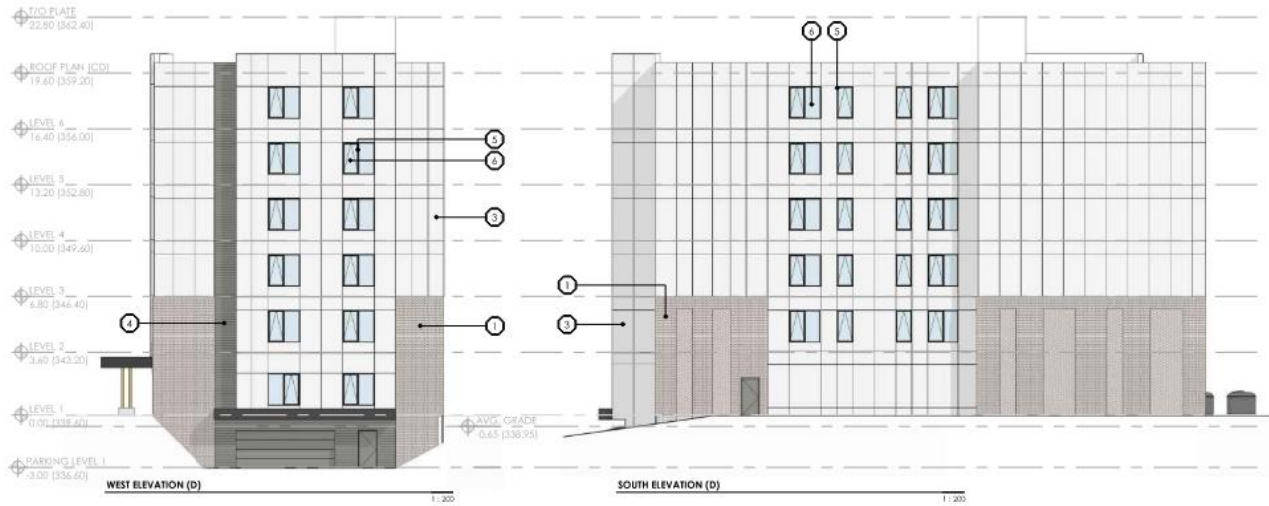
Proposed Front elevation (facing 149 Queen Street South) and South elevation (facing St. George Street).
